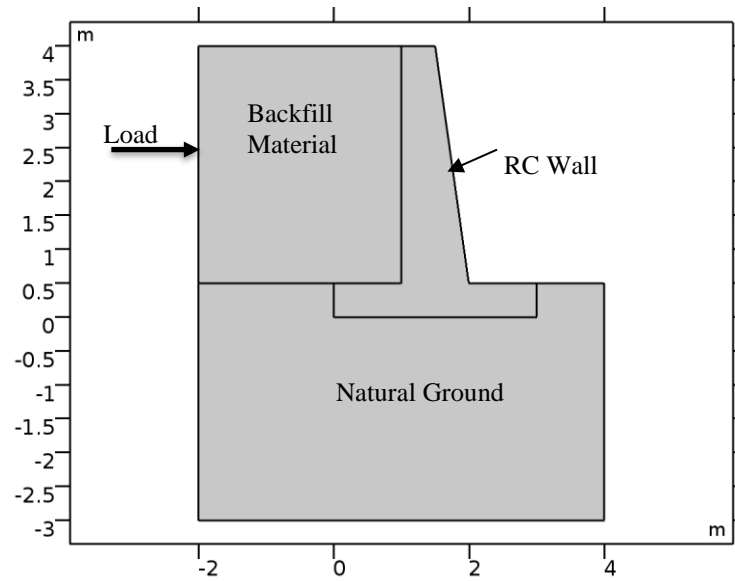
Model Geometry of a Tapered RC Retaining Wall
